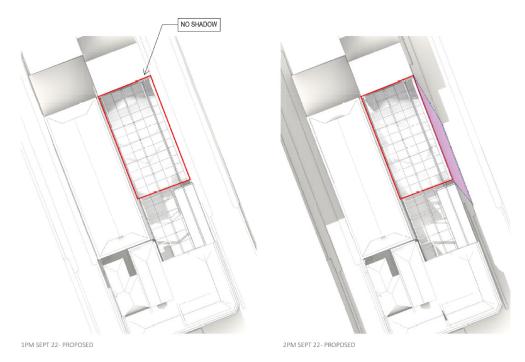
Shadows cast by the proposed building over Liverpool Street at 1pm (left hand image) and 2pm (right hand image) on 22 September (source: application plans prepared by Point Architects)
